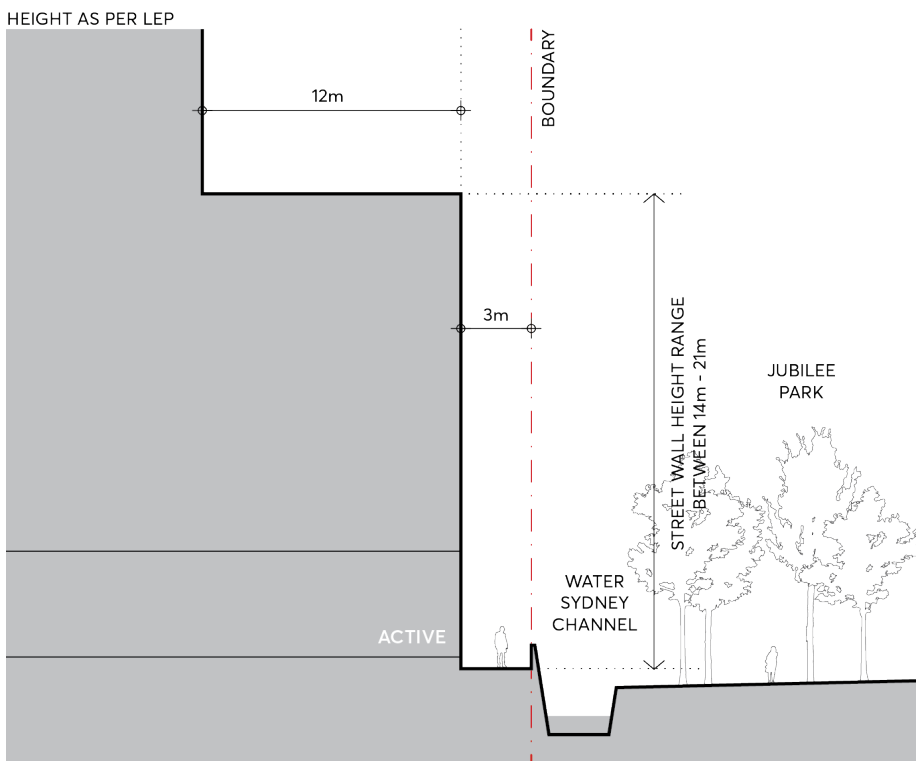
Jubilee Park Edge (Section F) Setbacks and Street Wall Height
